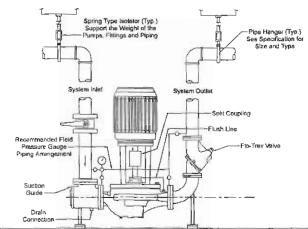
Alternative Arrangement to Reduce Footprint
